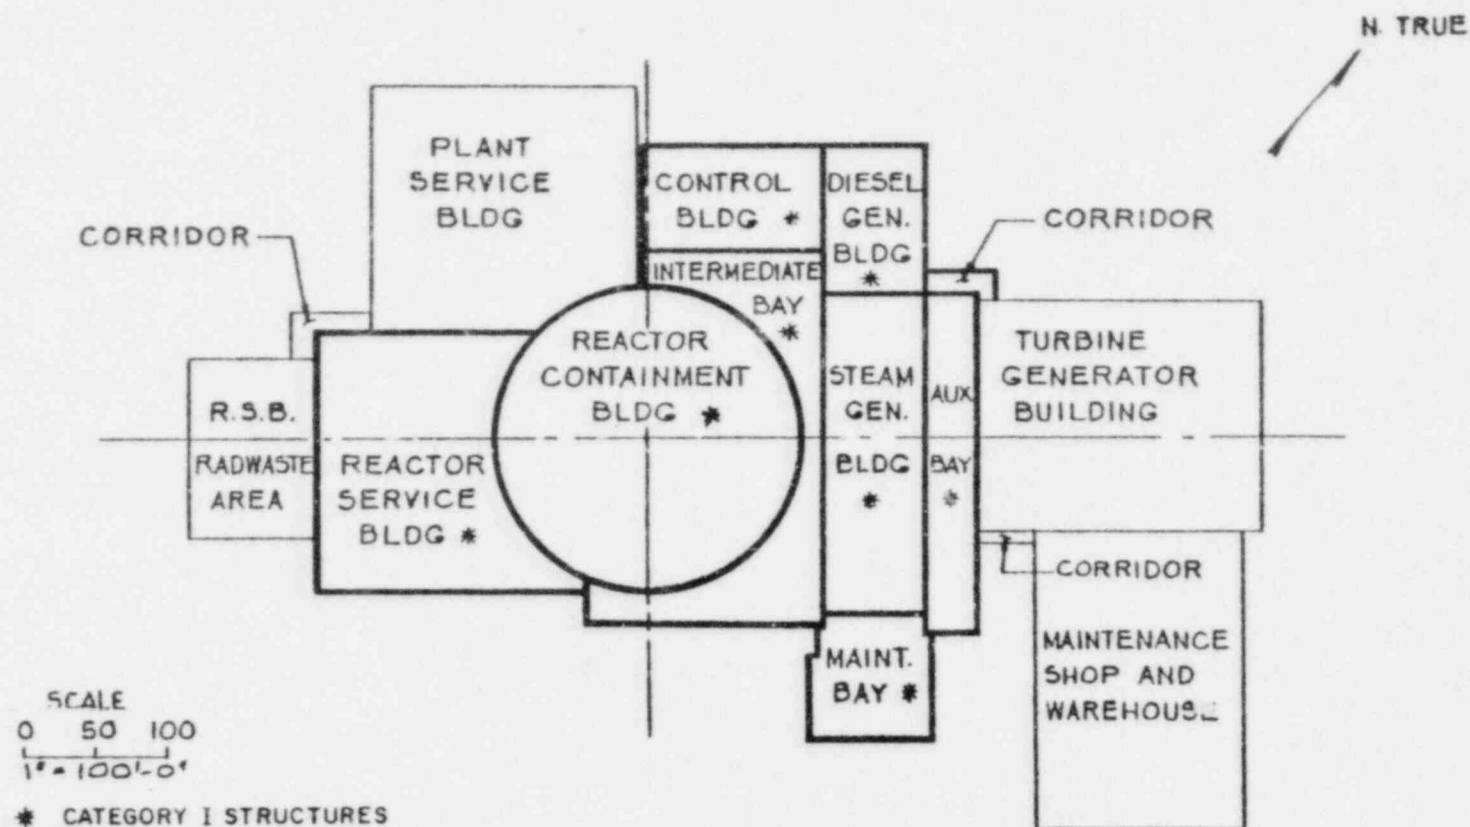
ARRANGEMENT OF PLANT STRUCTURES
